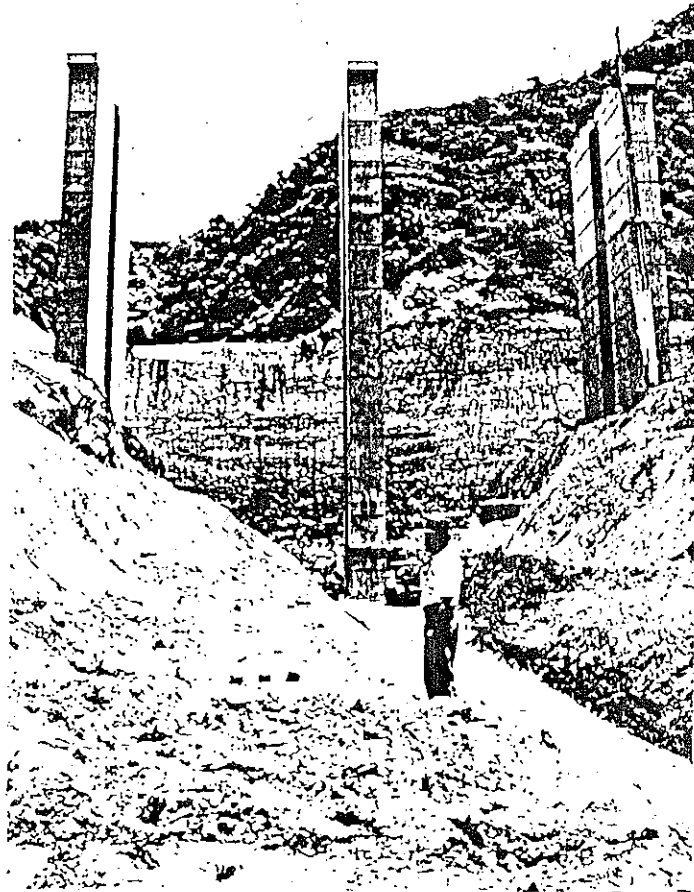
PIER AT C-6 BRIDGE (SIGNS OF EARTH FILLING
